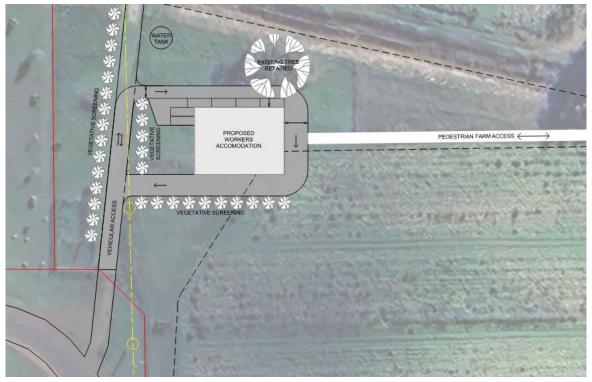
Revised Landscaping and Access Plan received 17 November 2025
